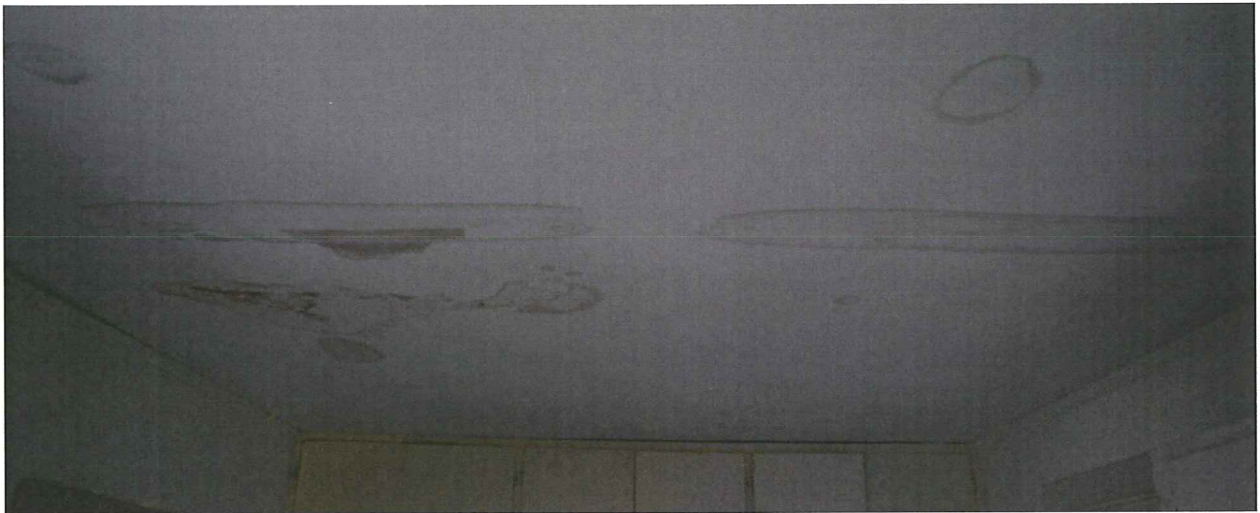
The roof over the addition is improperly drained and has been leaking through to the drywall below. Mold and water damage throughout.
